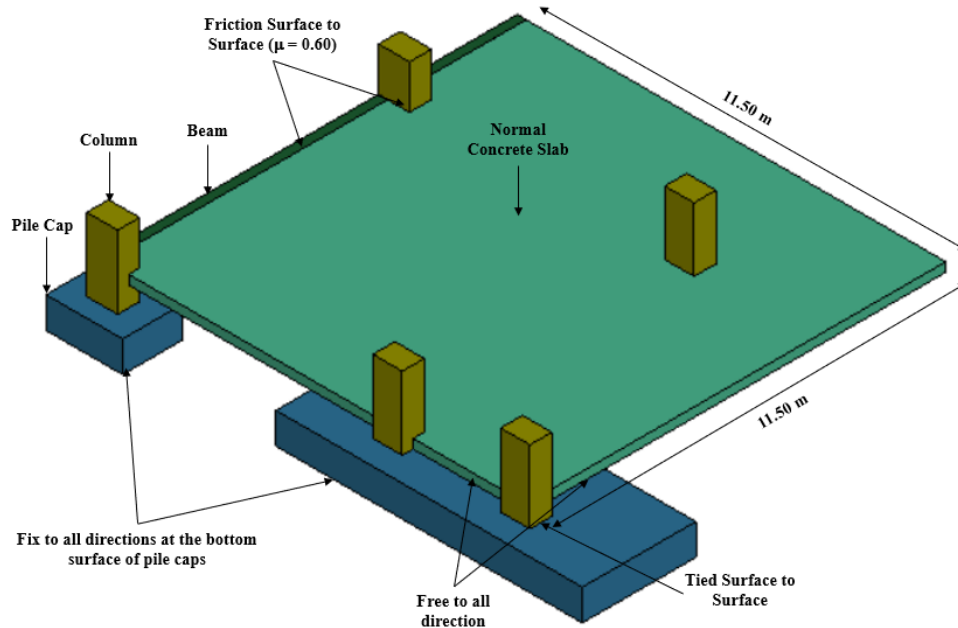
Three-dimensional FE model of slab on beam at construction site 2
